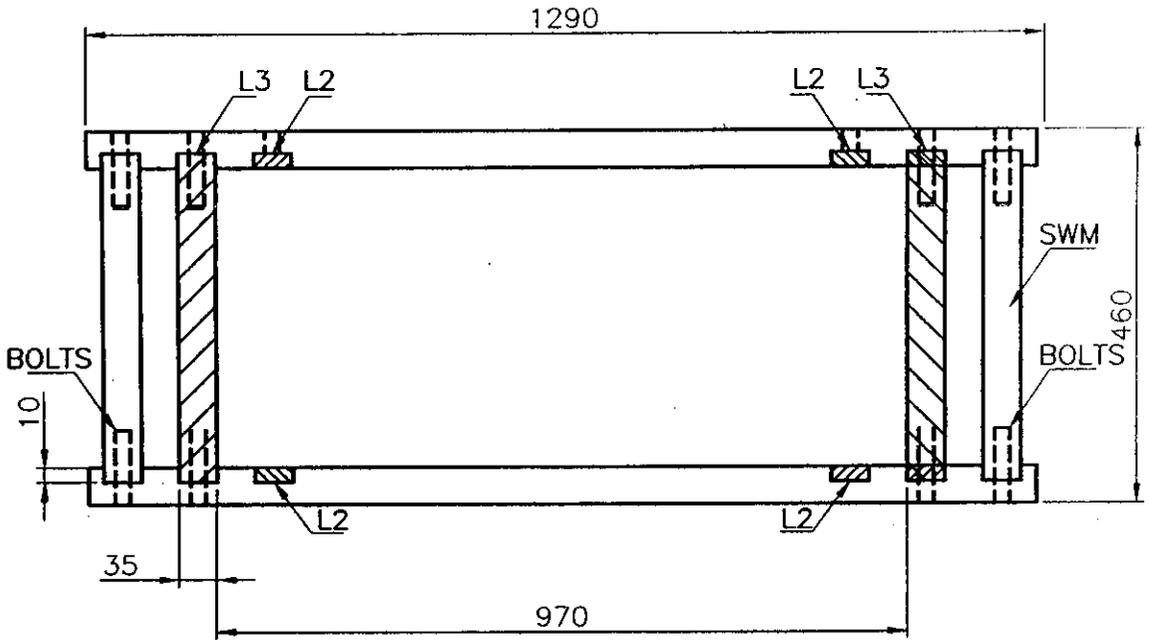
MOULD ASSEMBLY FOR STANDARD SLAB
